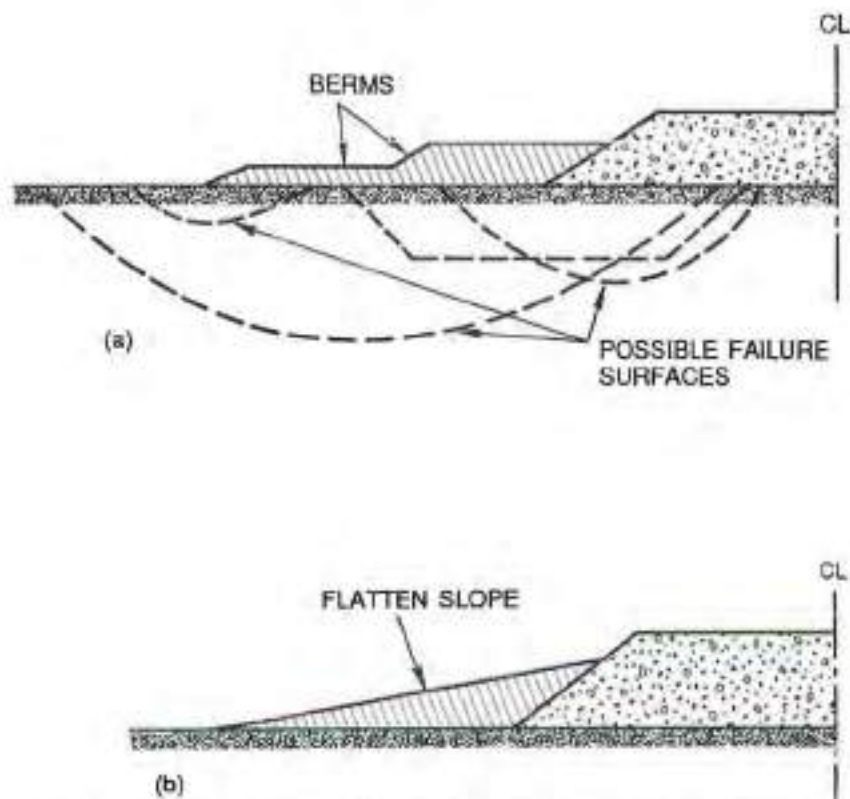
Embankments stabilized with (a) berms or (b) flatten slopes (courtesy New York State Department of Transportation).
